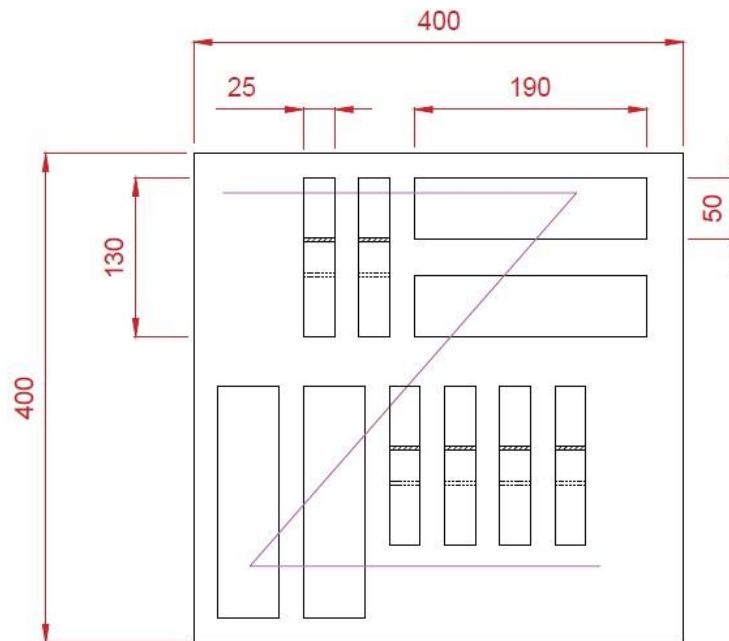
Specimens cut out plan form plywood panel in millimetres
